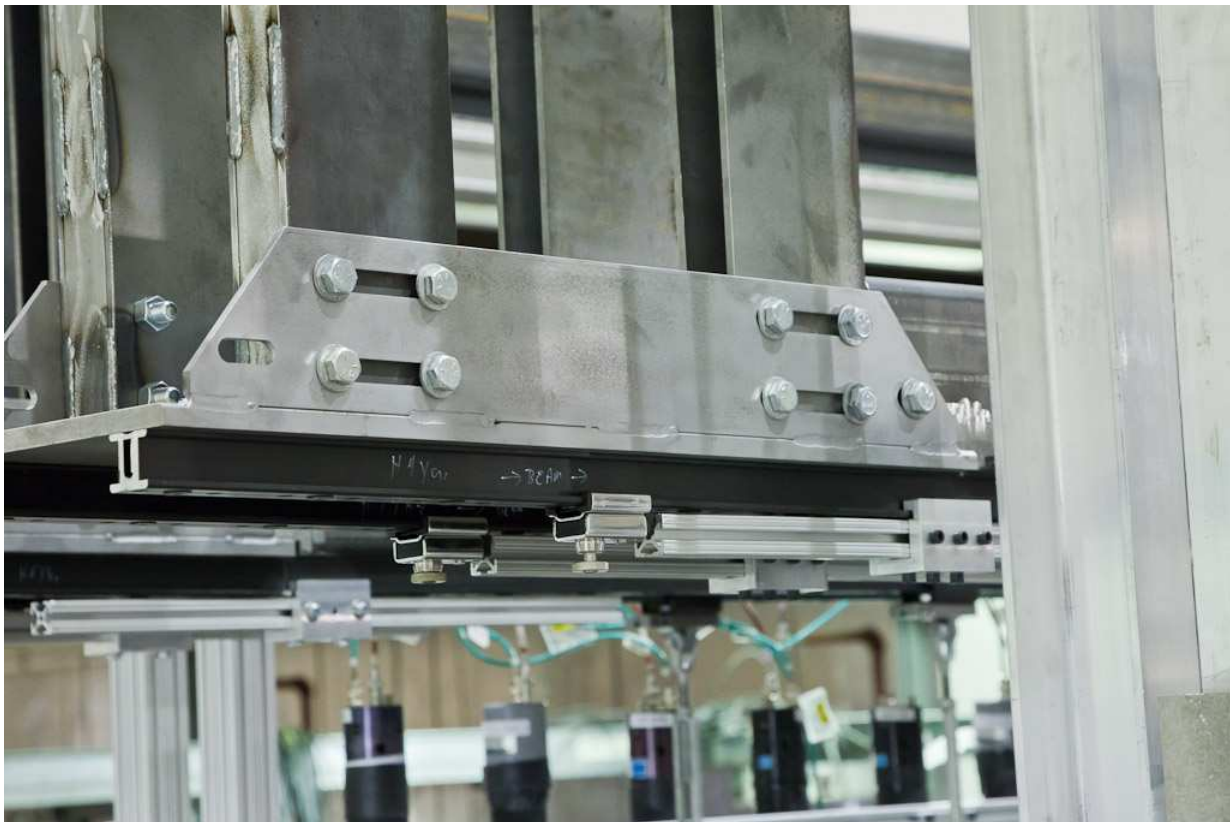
Photo of the groove welds on the bottom portion of the Drop Connector
